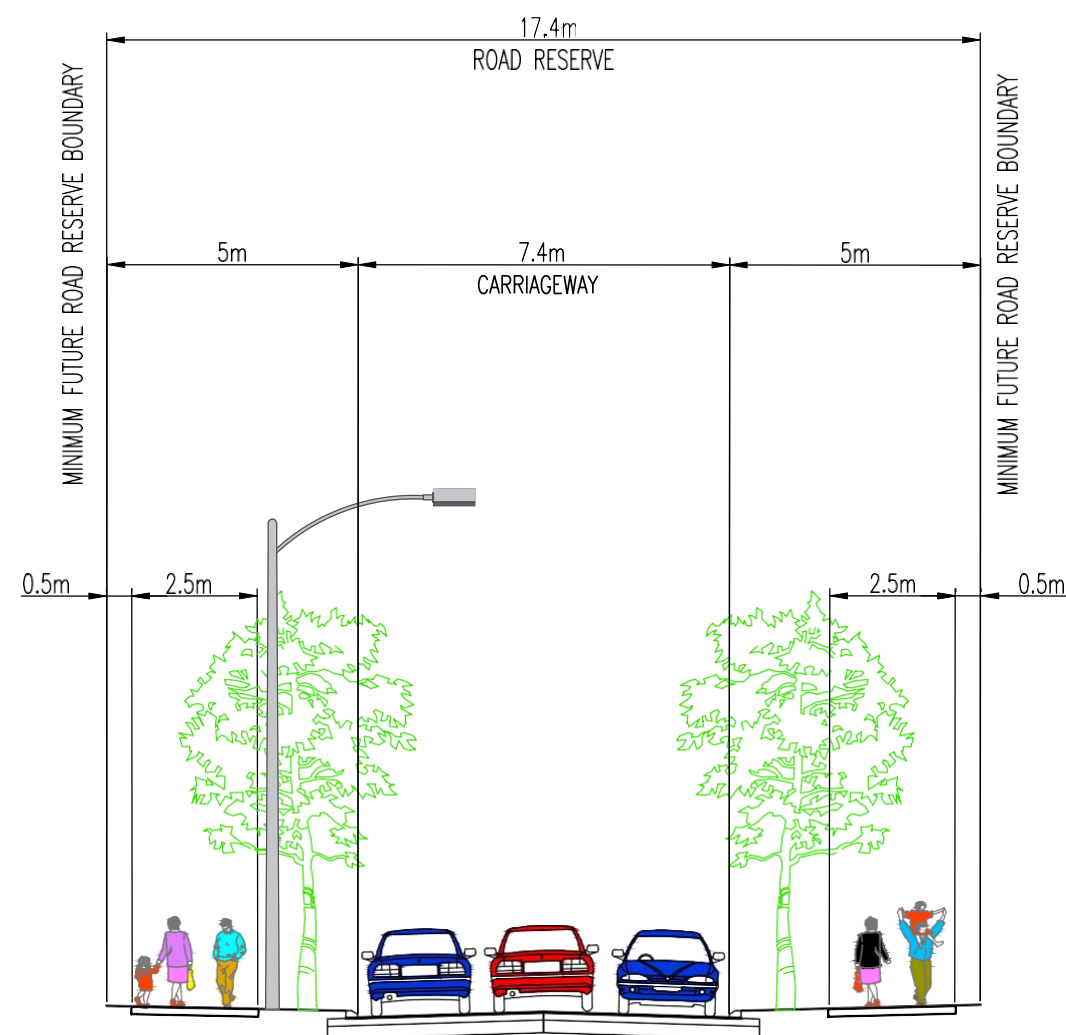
CROSS SECTION OF ACCESS STREETS C
